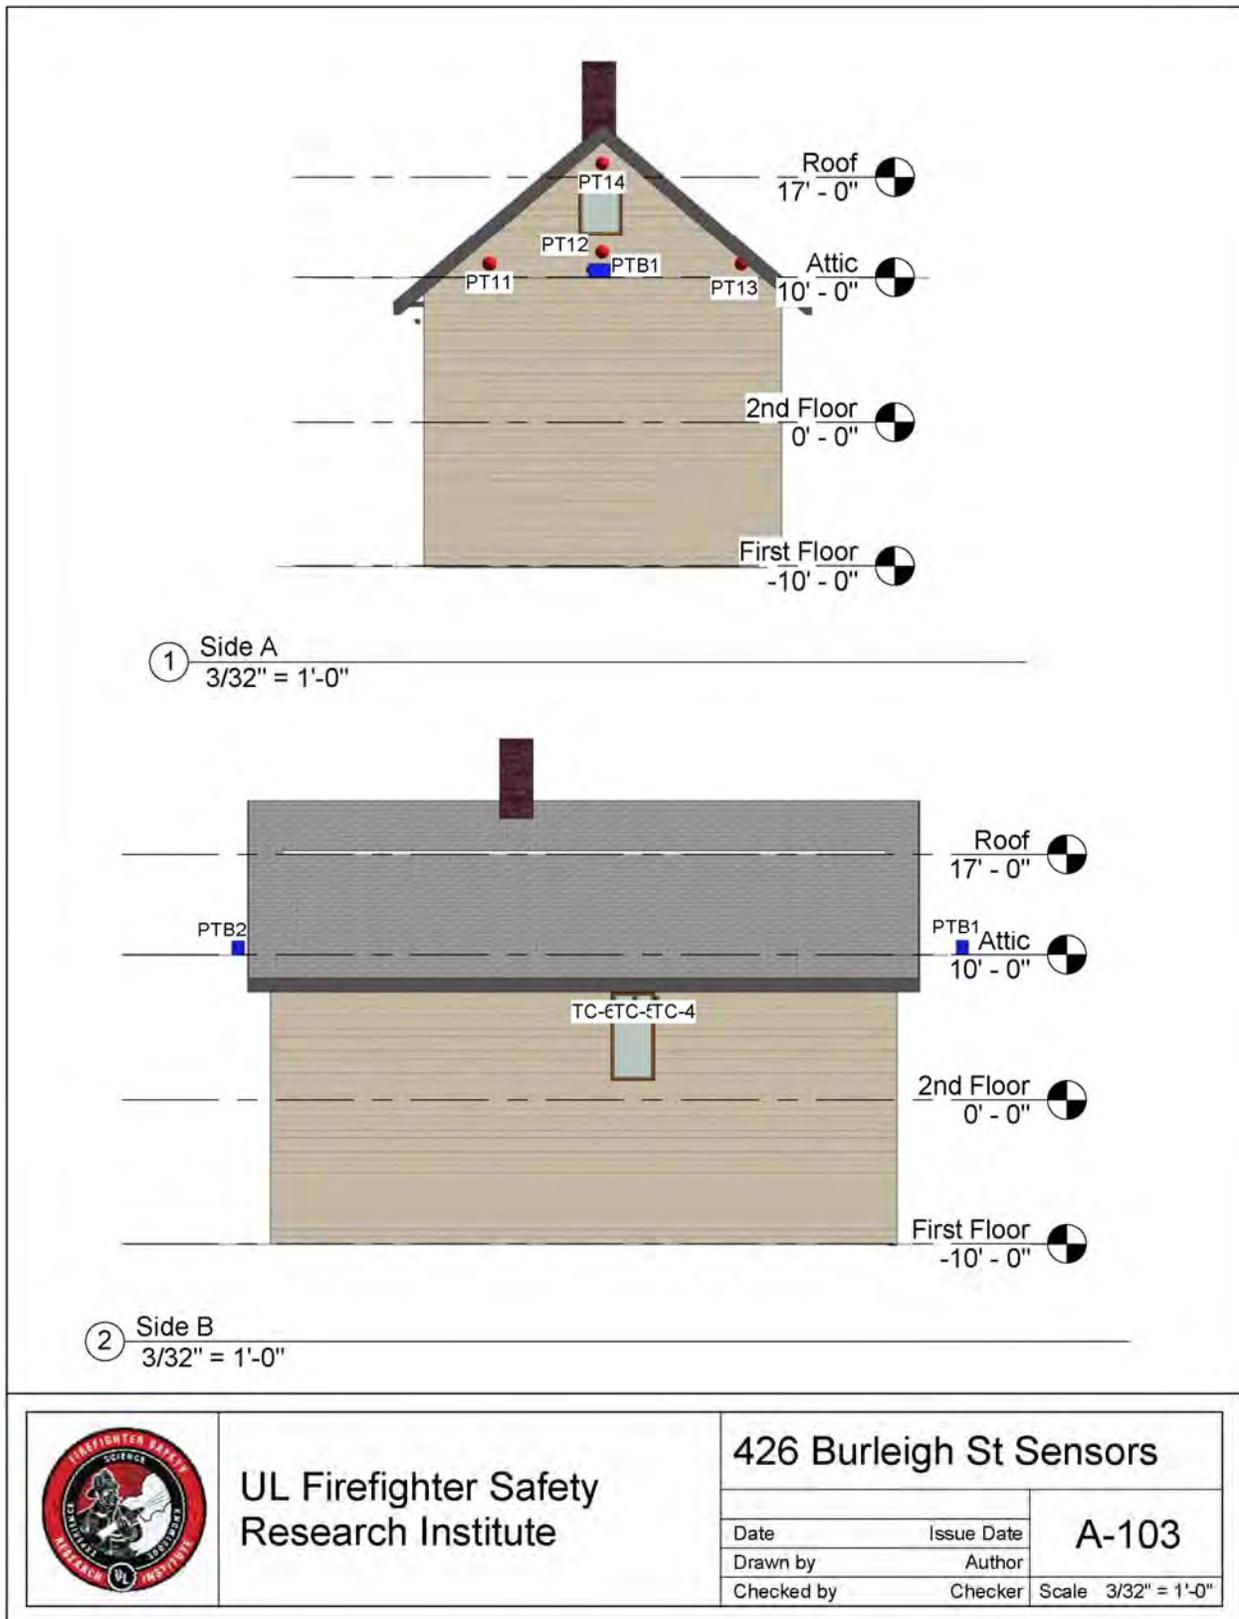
Field Experiment 2 - 426 Burleigh Street Sensors Side A & Side B Elevations
